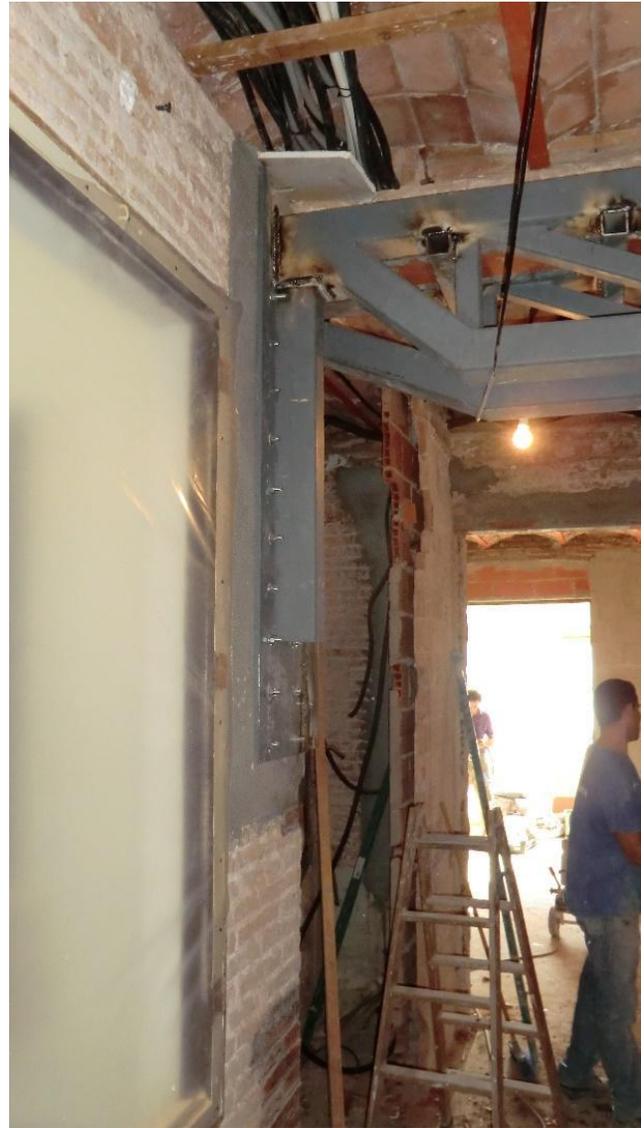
Anchor plate in a 15 cm thick wall, made of solid brick masonry with lime mortar. ©Josep Baquer
